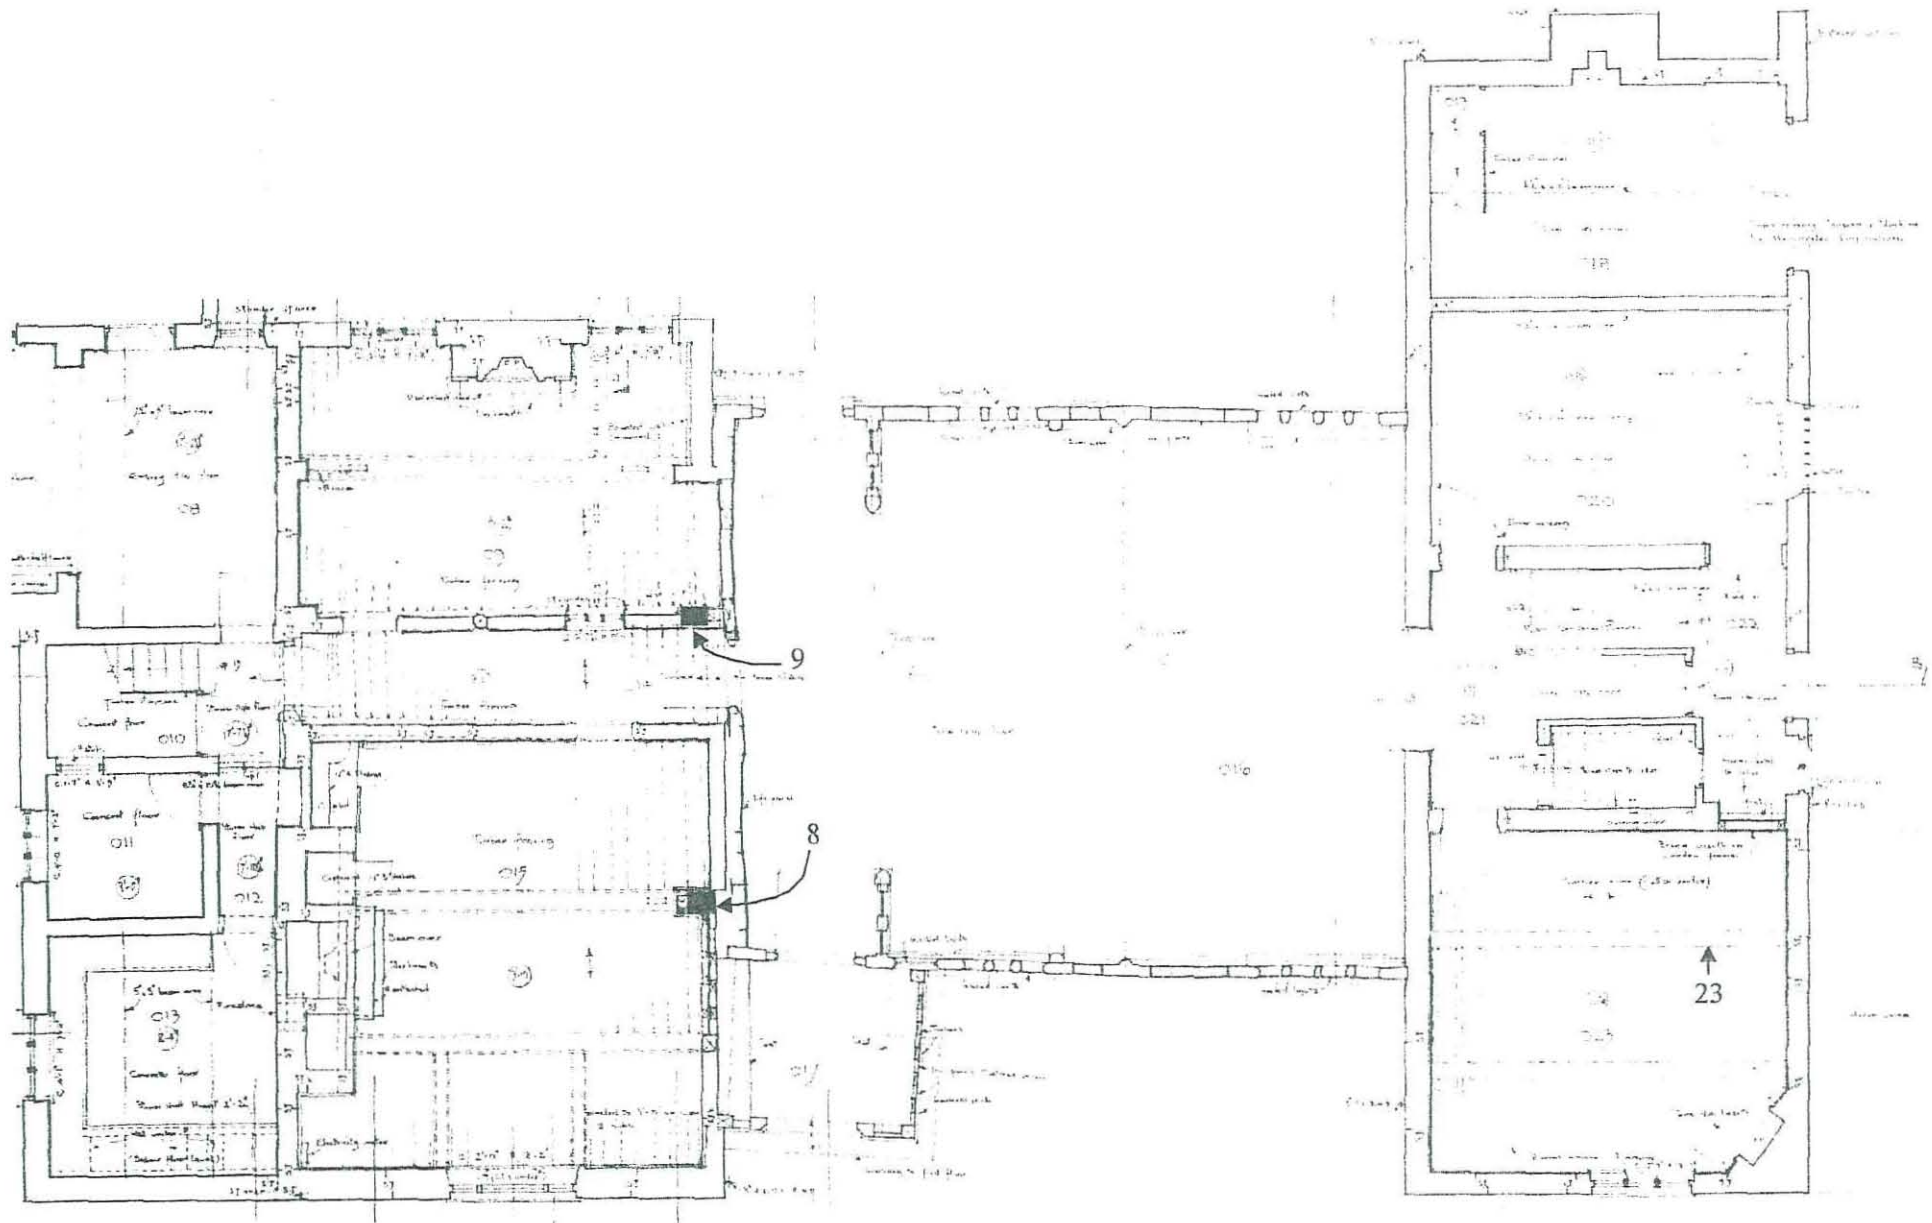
Baguley Hall. Plan at ground floor level showing location of samples 8, 9, and 23
